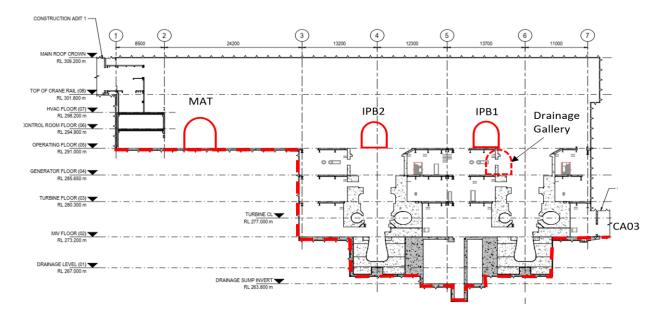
Status of powerhouse excavation works as at 19th April 2024
